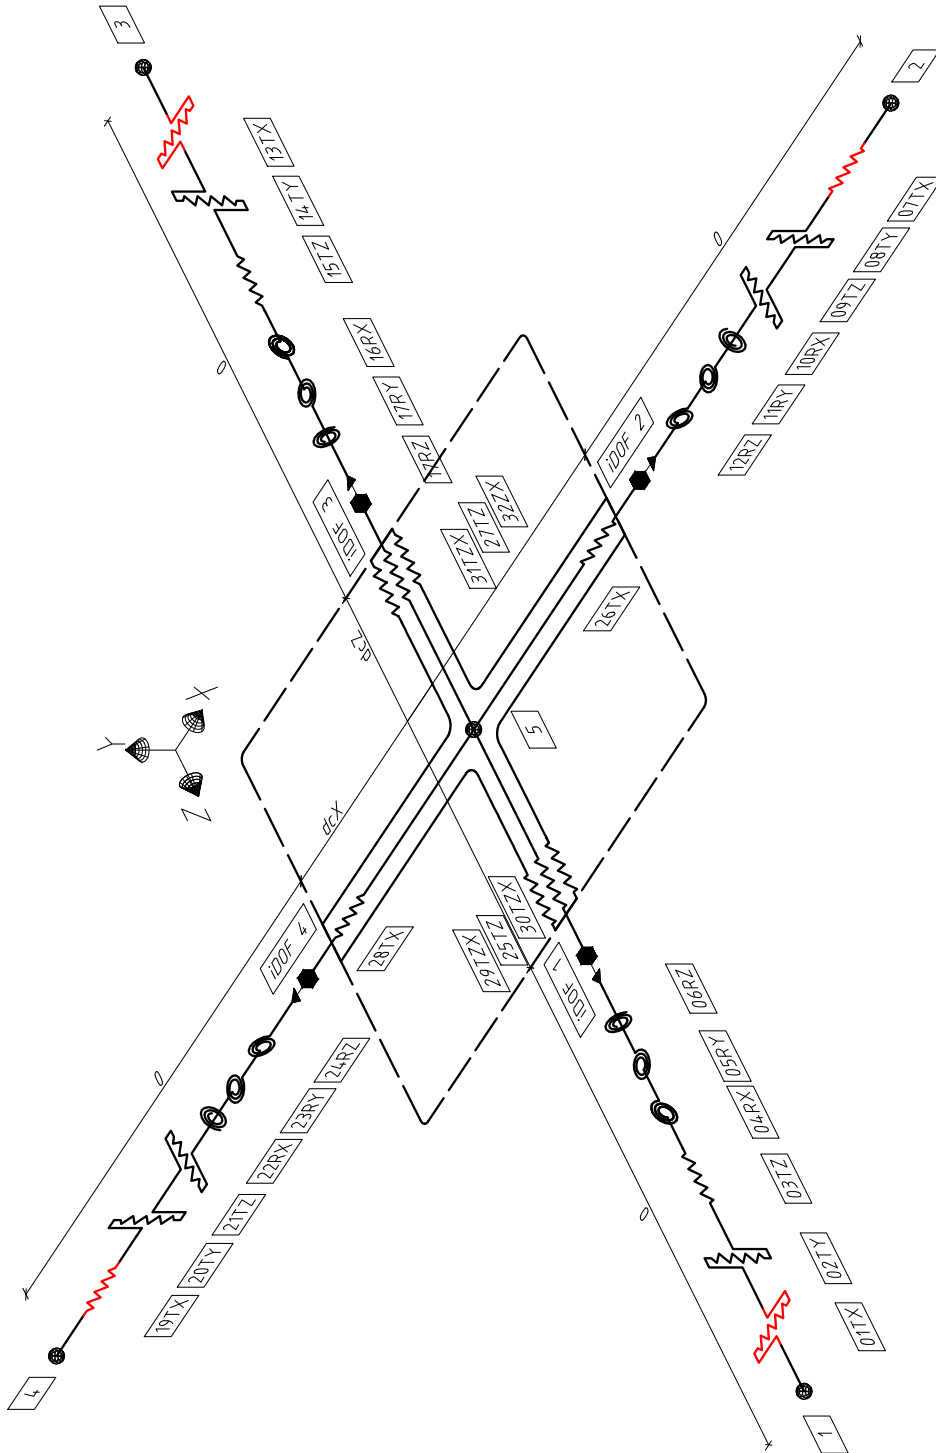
Components of the beam-to-column joint finite element: linear deformation in the X direction.
